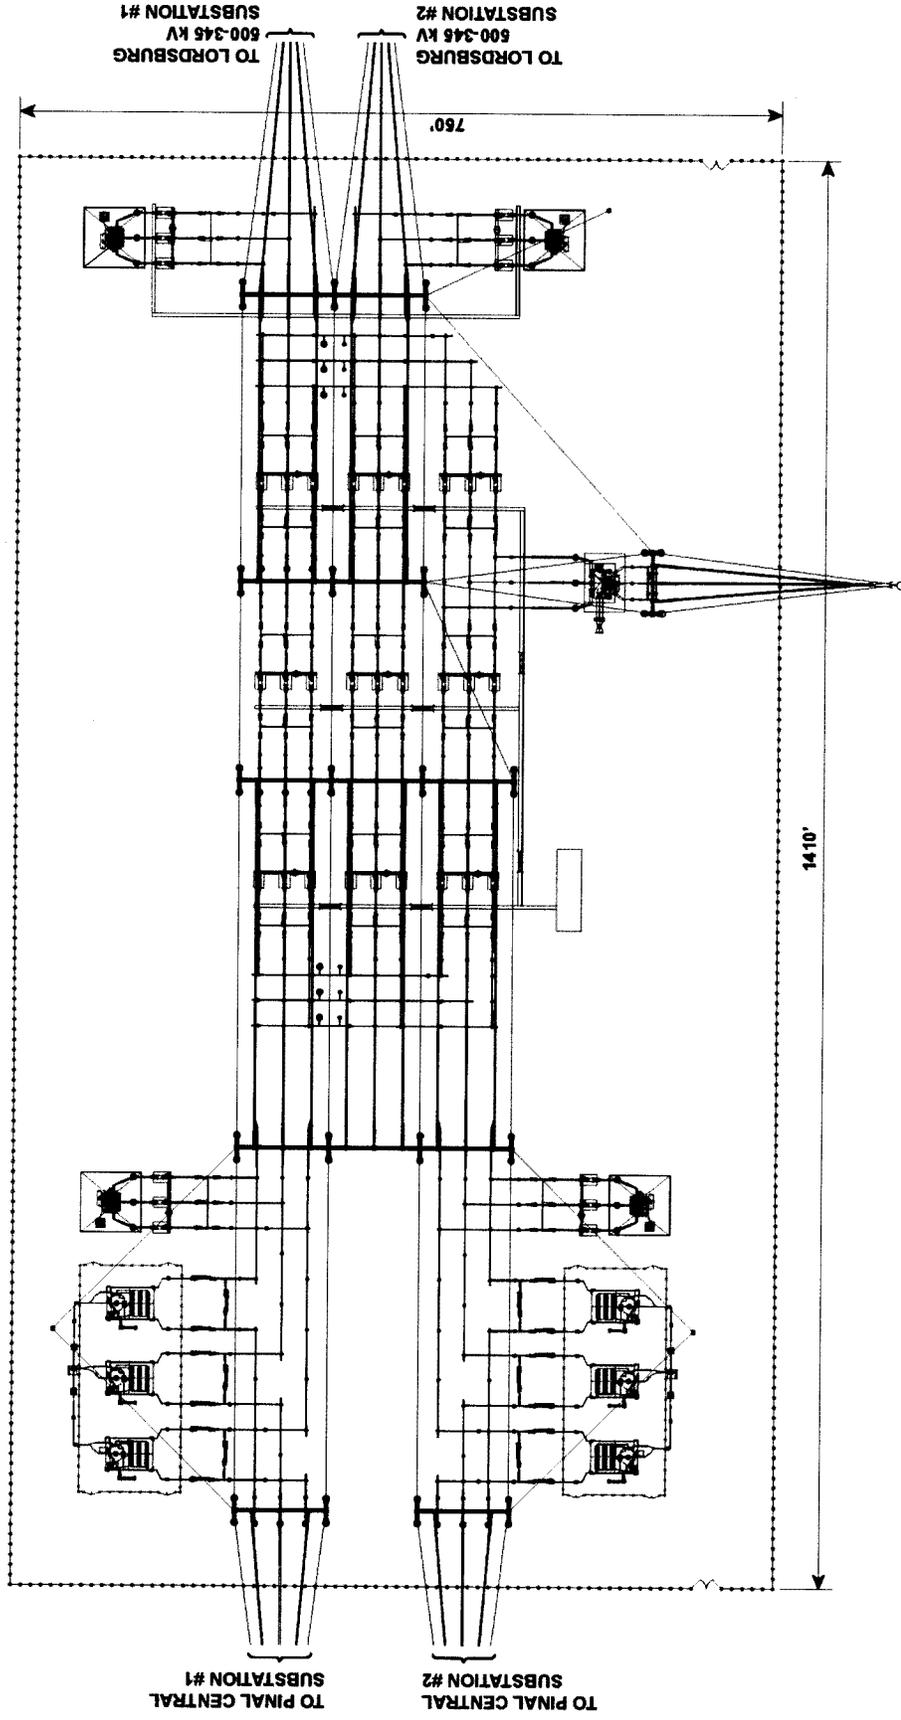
Proposed Substation Layout: Willow-500kV
